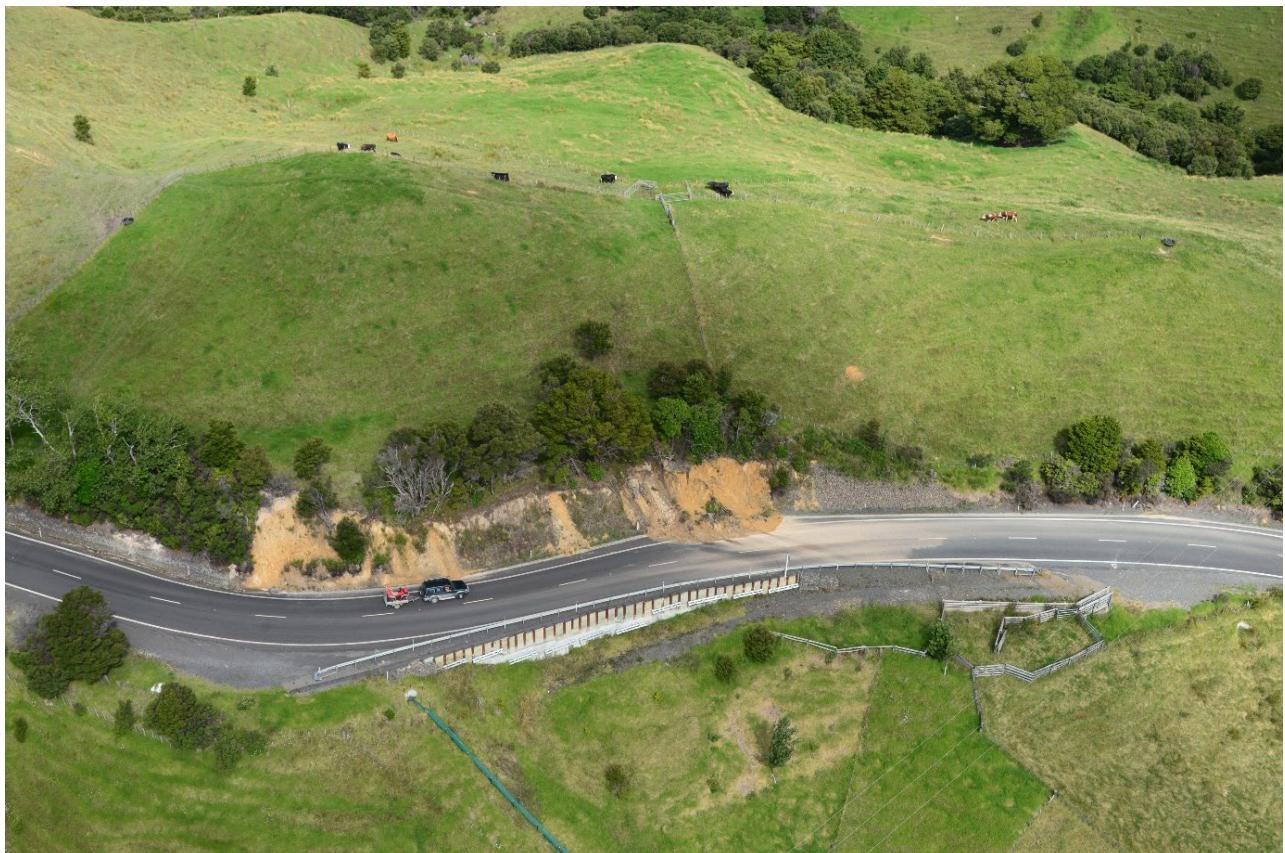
Photo DSC\_9856: Examples of road-cut failures along State Highway 25, Wilson Bay, Coromandel Range.
